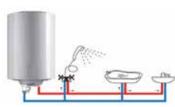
Storage Water Heater, a closed outlet water heater that connects to many points.
